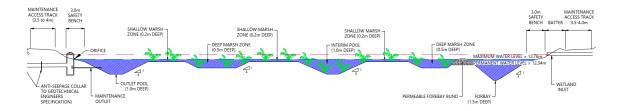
Wetland 2-2 Cross section A, DWG No. P24-447-01-3604-DR
